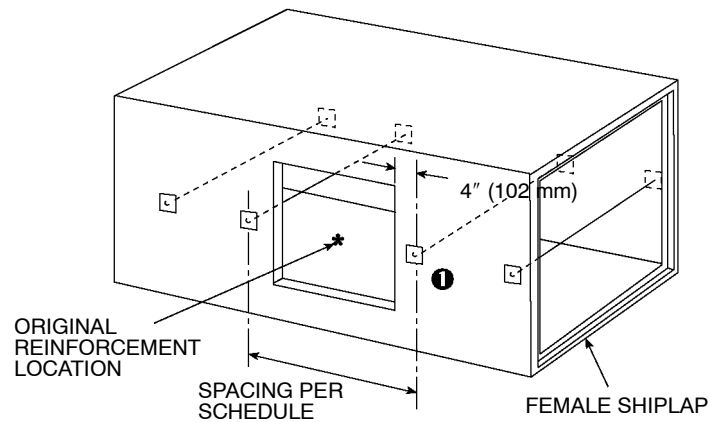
ACCESS DOOR LOCATION INTERFERING WITH REINFORCEMENT
